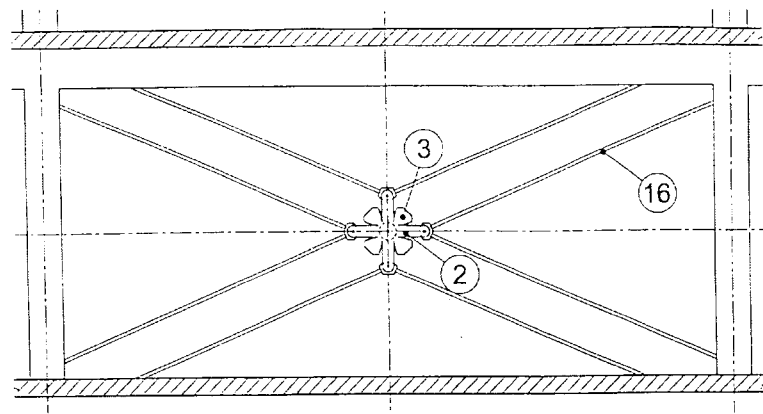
Campenon Bernard hysteretic damper in a steel frame
